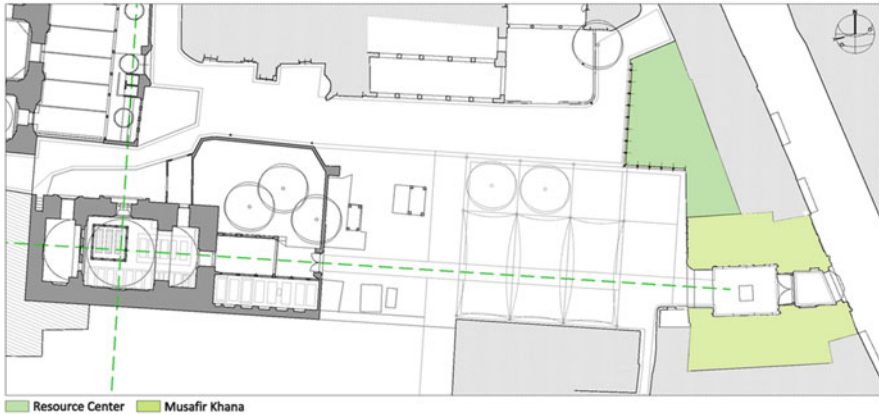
Musa Pak Courtyard design: planimetric drawing
